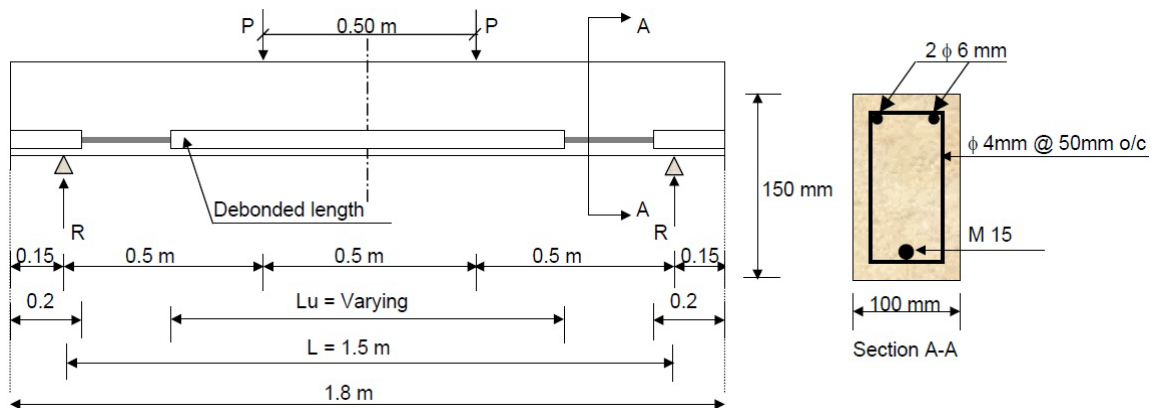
Details of Test Specimens (Sharaf and Soudki 2002).
